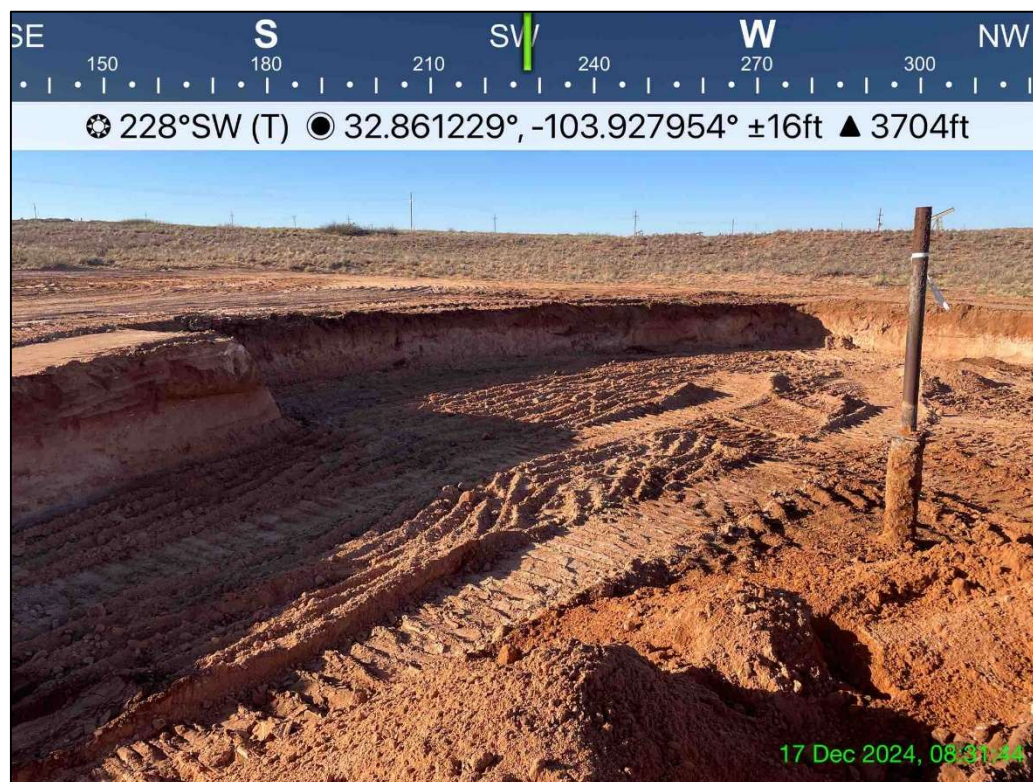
Excavation overview, facing southwest of southern portion of the excavation
